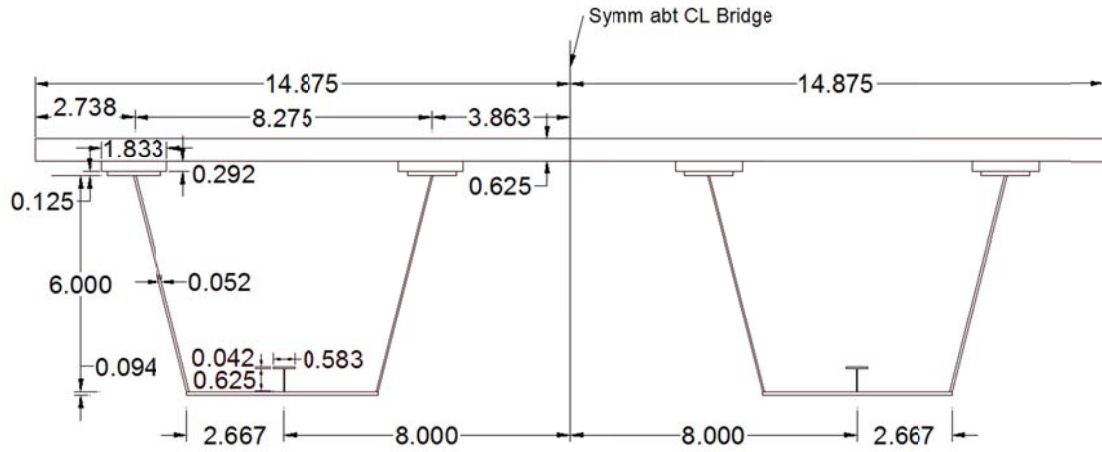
Typical steel BOX cross section (2) for L = 180ft at pier location
